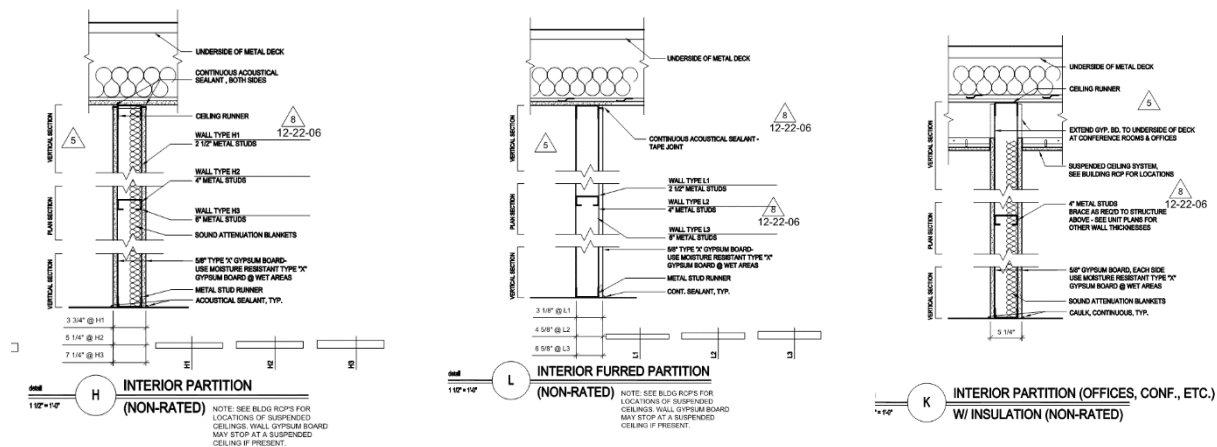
Expanded plansets for each wall-type that's typical for the walls used throughout Poly Canyon Village
